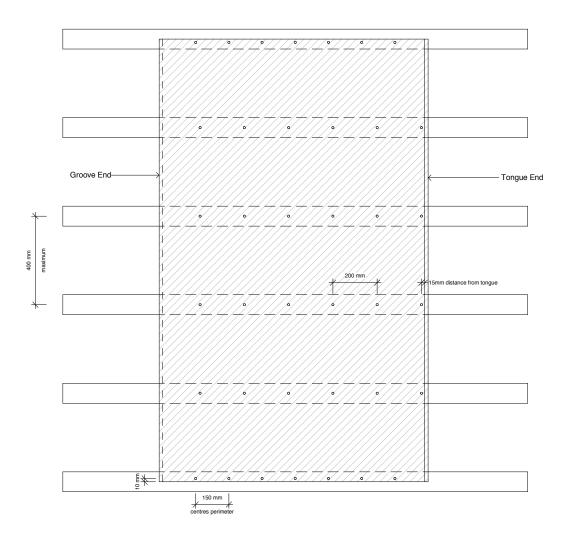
Strandfloor® / SuperPine® Joist Layer Installation
